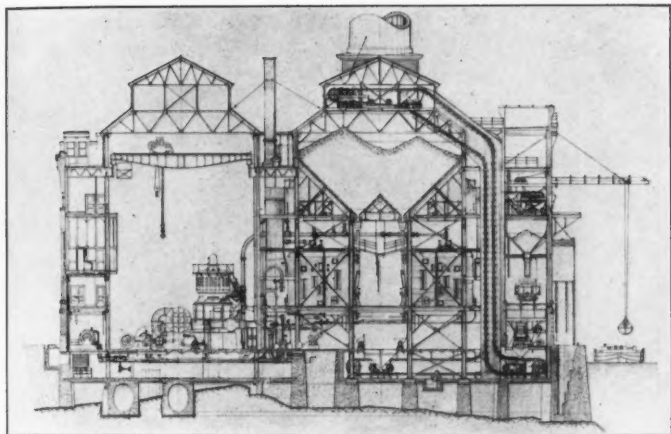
TYPICAL CROSS-SECTION OF THE PORT MORRIS POWER STATION.
